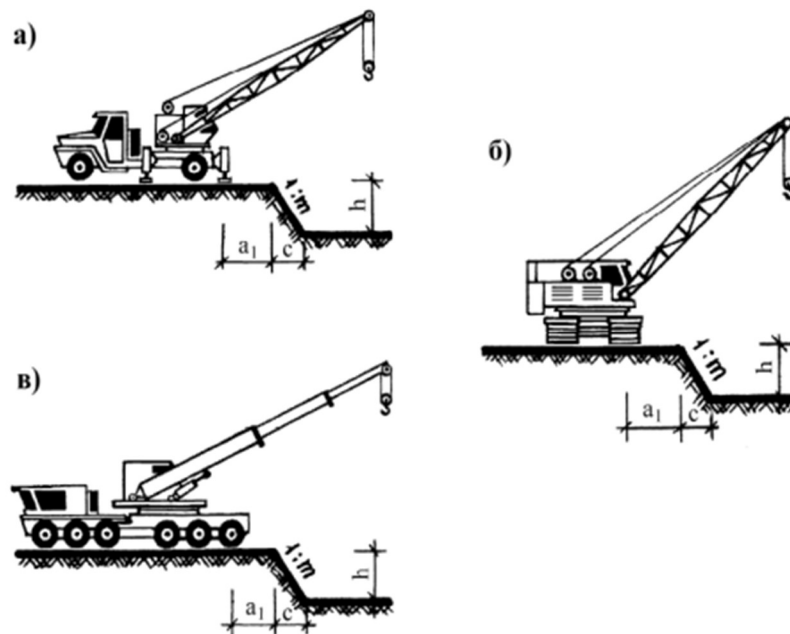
Linking jib cranes to the dimensions of open pits or pits: a) cranes on a road track, b) on a crawler track; c) cranes on a special ramp
